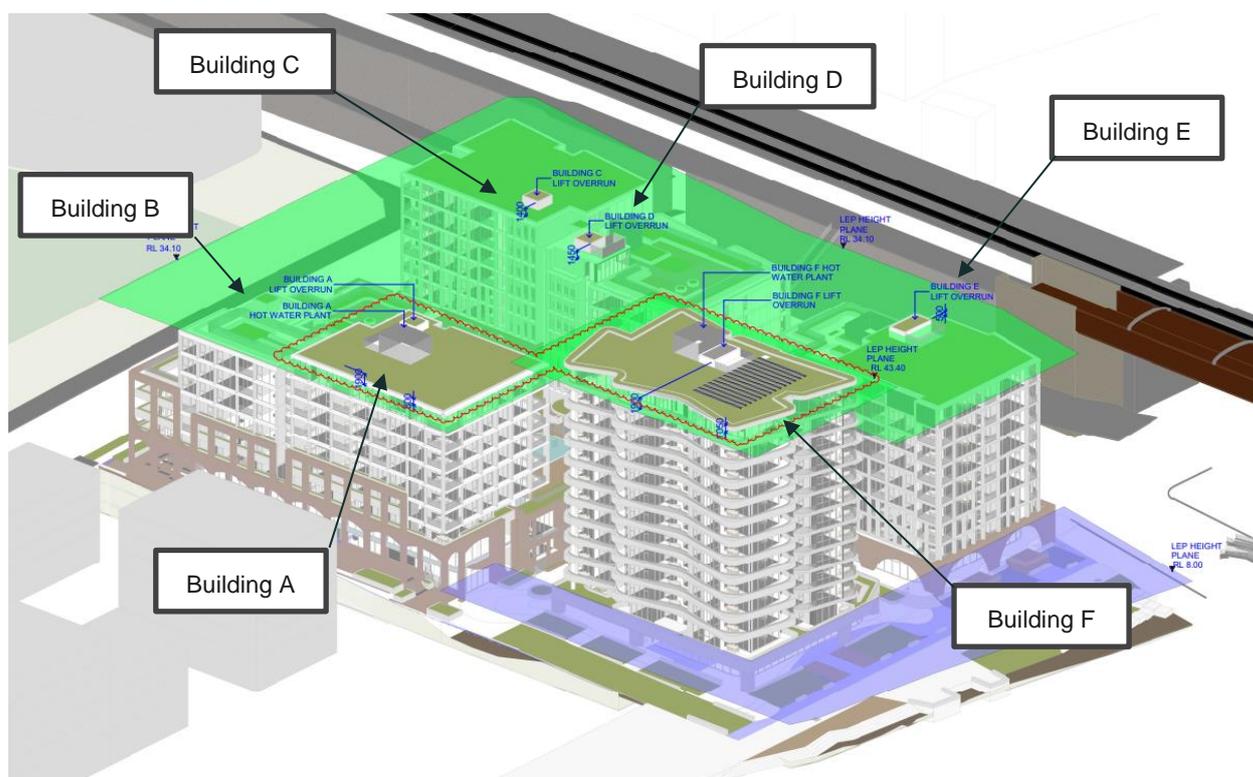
Height plane diagram, height planes shown in green, amended areas outlined with red cloud (Source: SJB)
